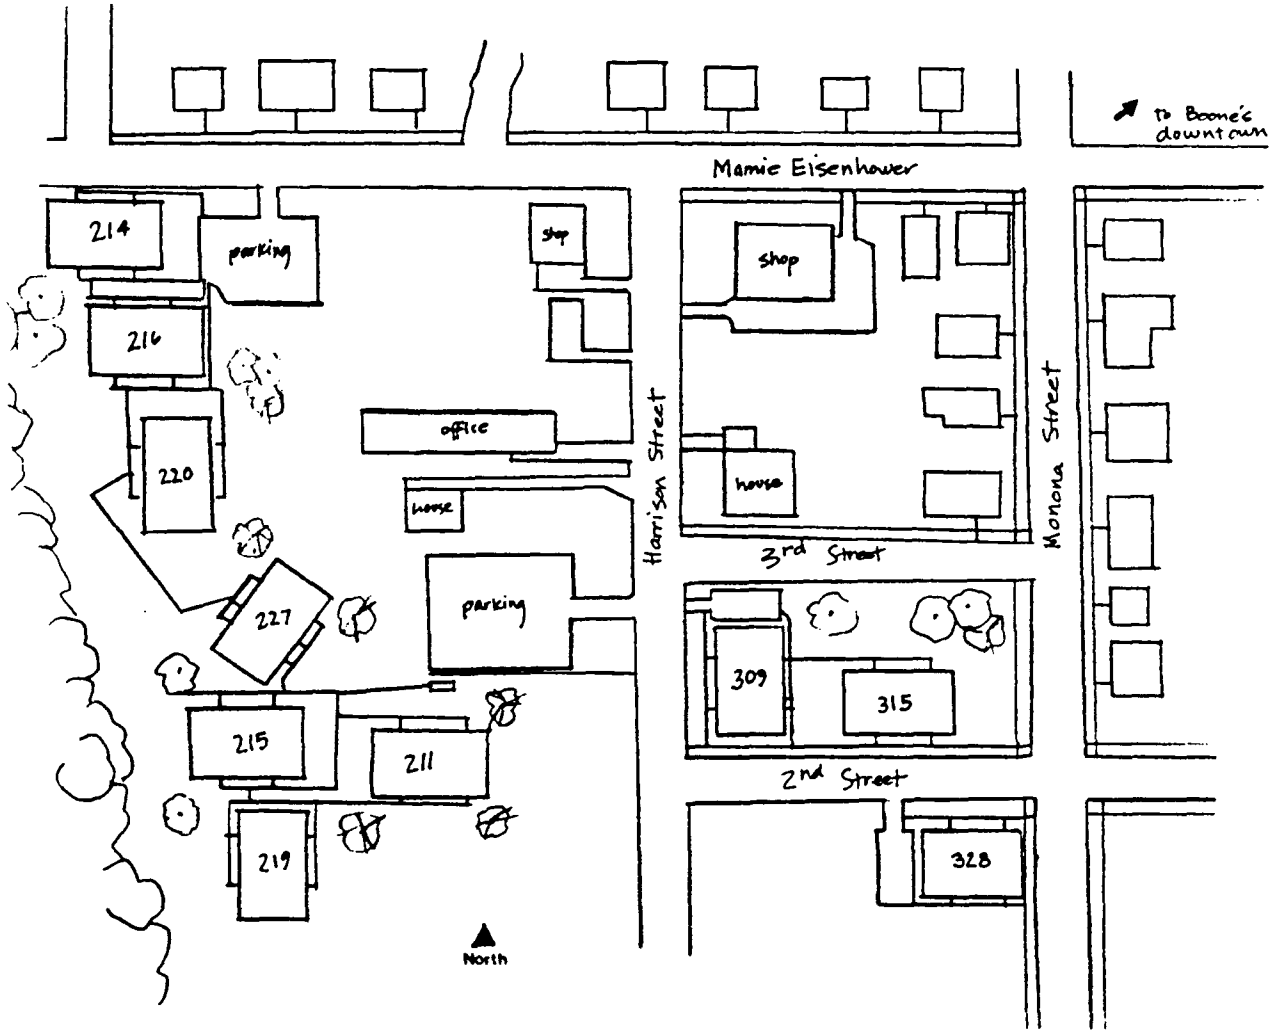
Midtown Village: Site Plan, Boone, Iowa
